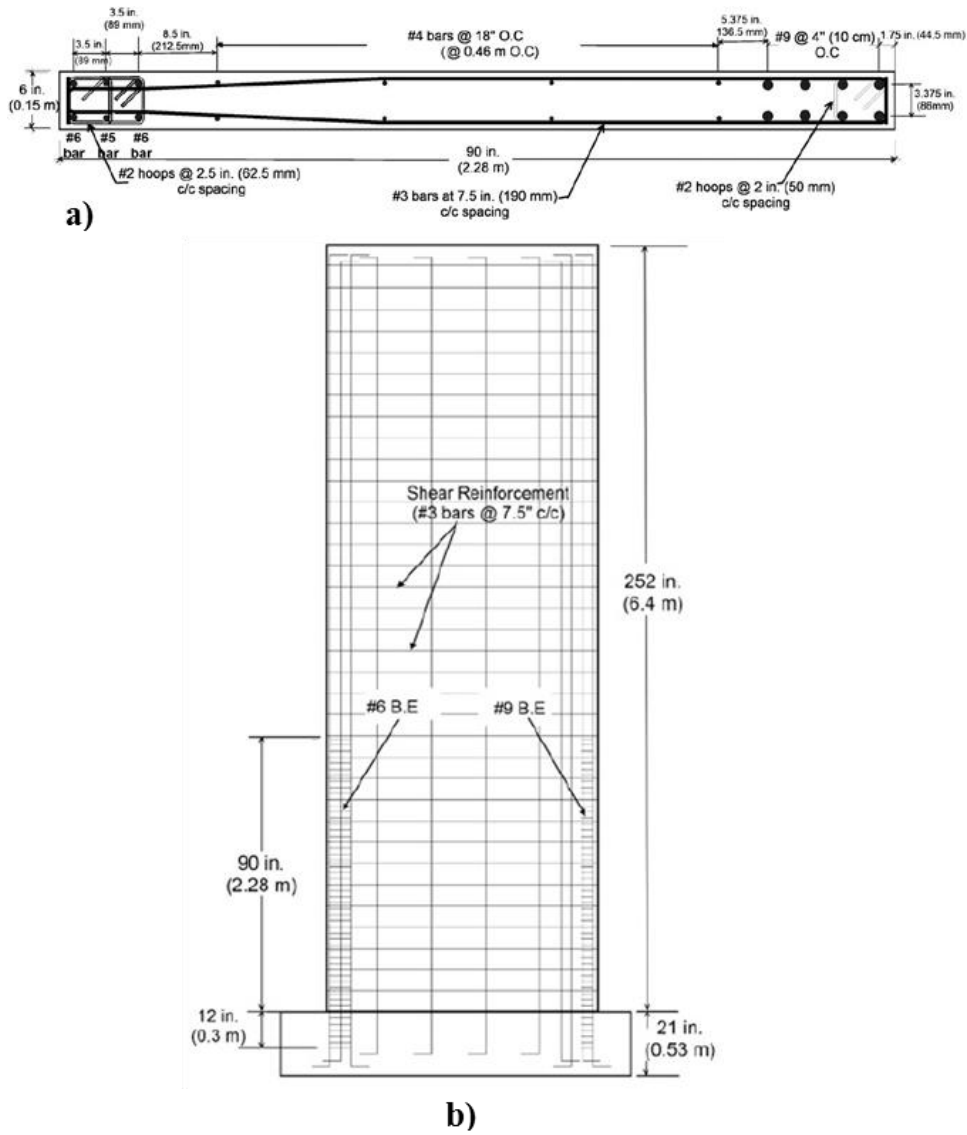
Aaleti et al. (2013) – a) Specimen cross-section, and b) Elevation view
